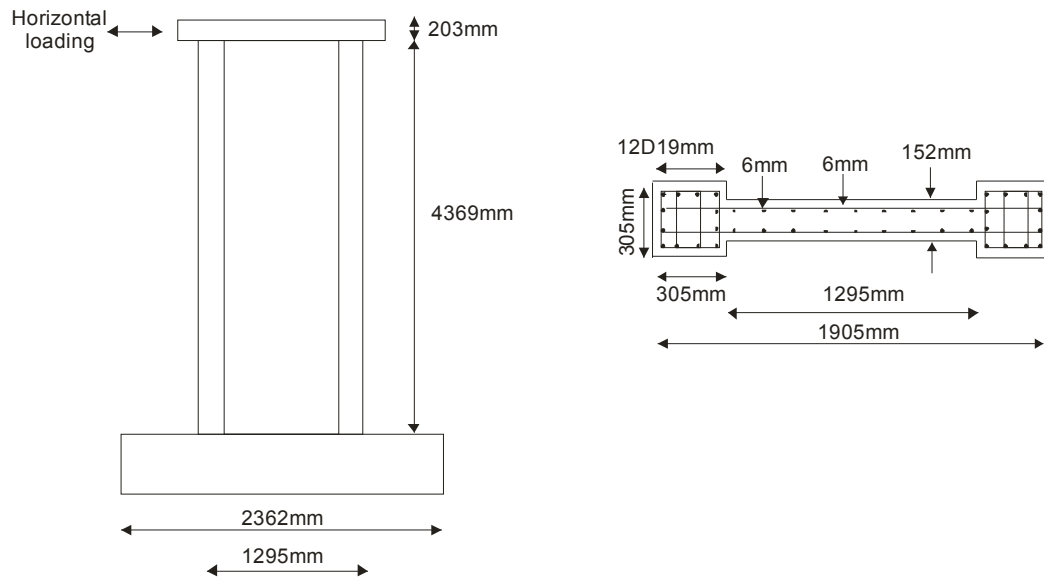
Wall geometry and reinforcing details for Oesterle B9R
